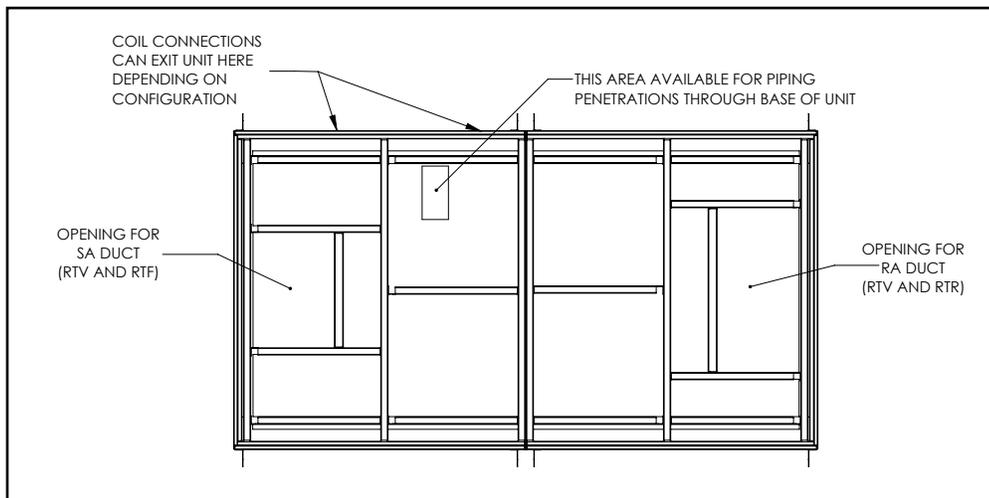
PIPING PENETRATIONS DRAWING B
